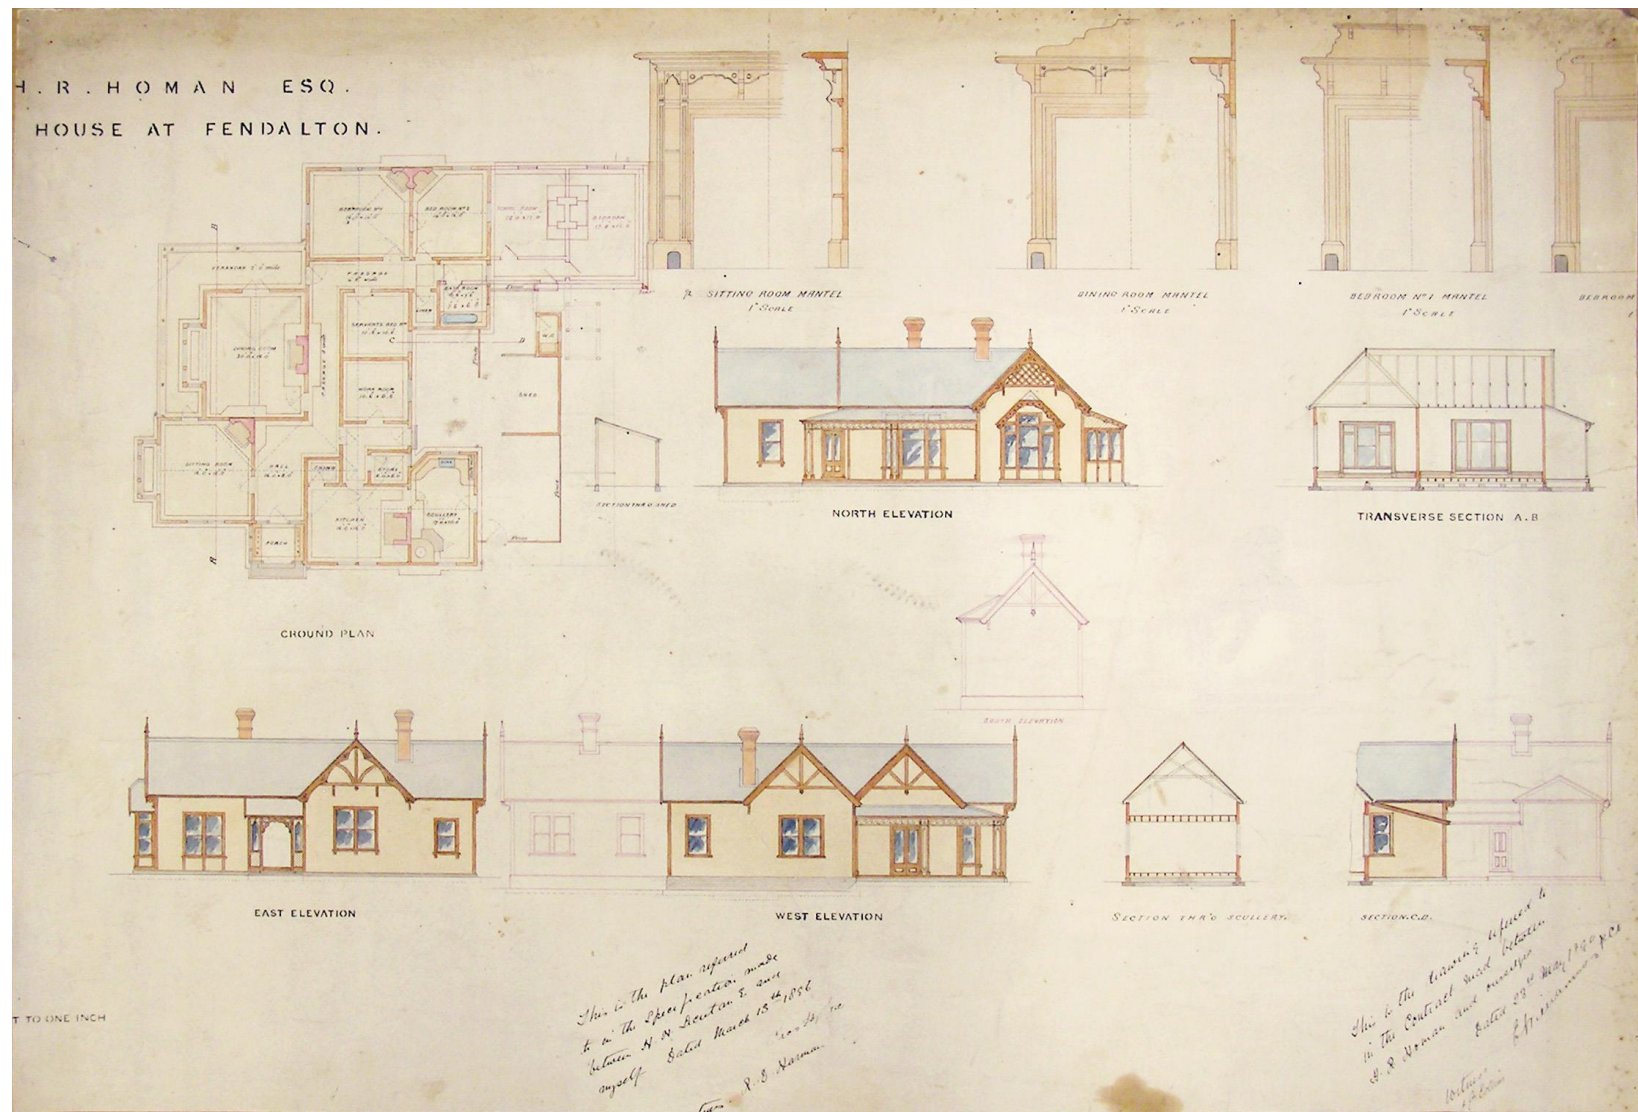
Collins and Harman, H. R. Homan, Esq., House at Fendalton, plan, elevations, section and details (1890).
